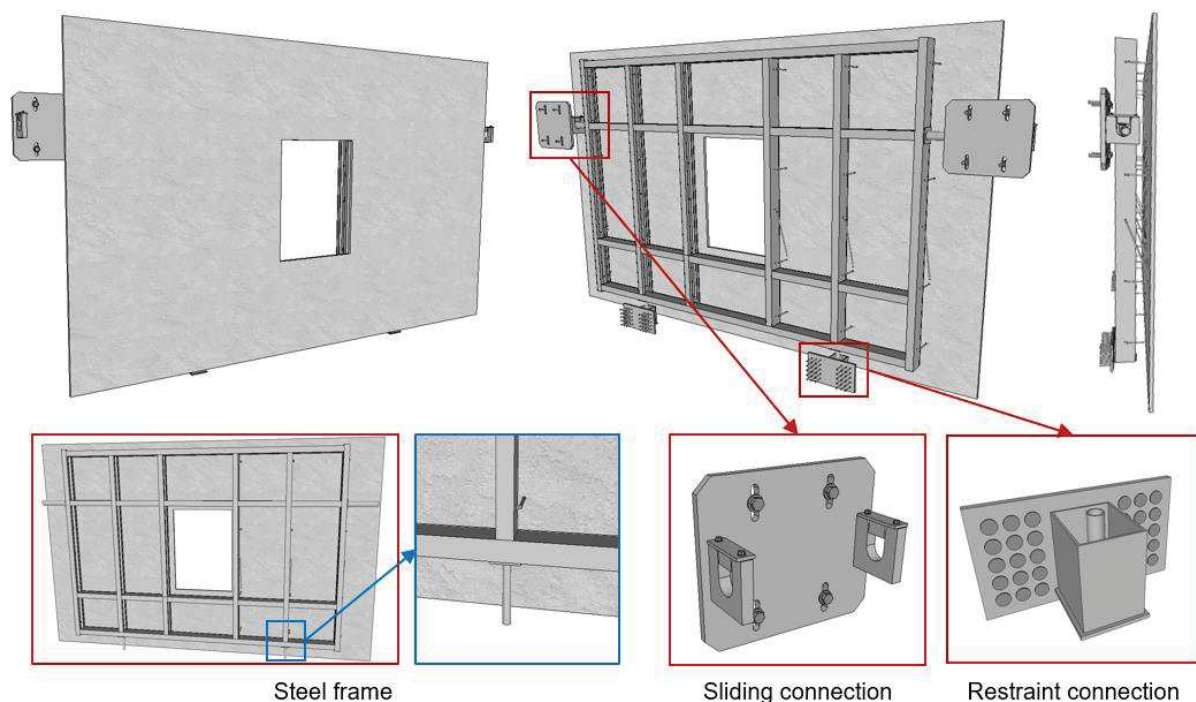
Detailing of a GFRC cladding system to be located within level 1 and 2 of Skeleton Building.
